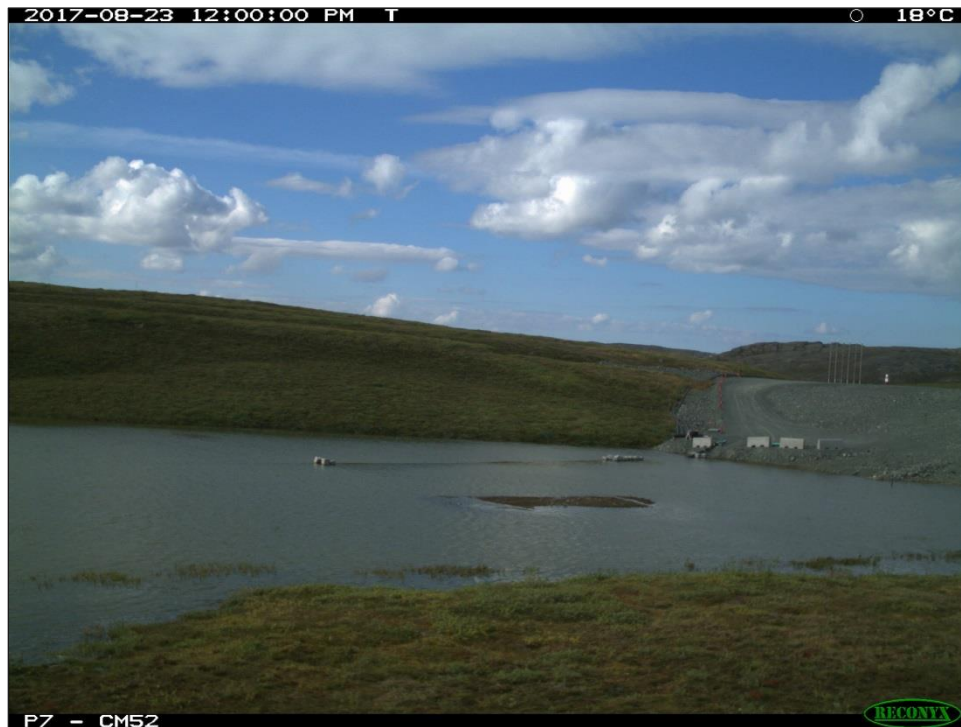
Example of the monitoring view of Camera 52 at the North Dam of the TIA, September 2017.
